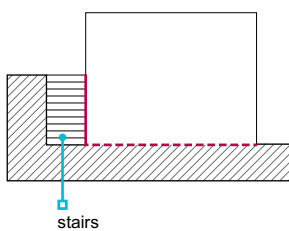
Stepped floor slabs where the retained ground is greater than 150mm
